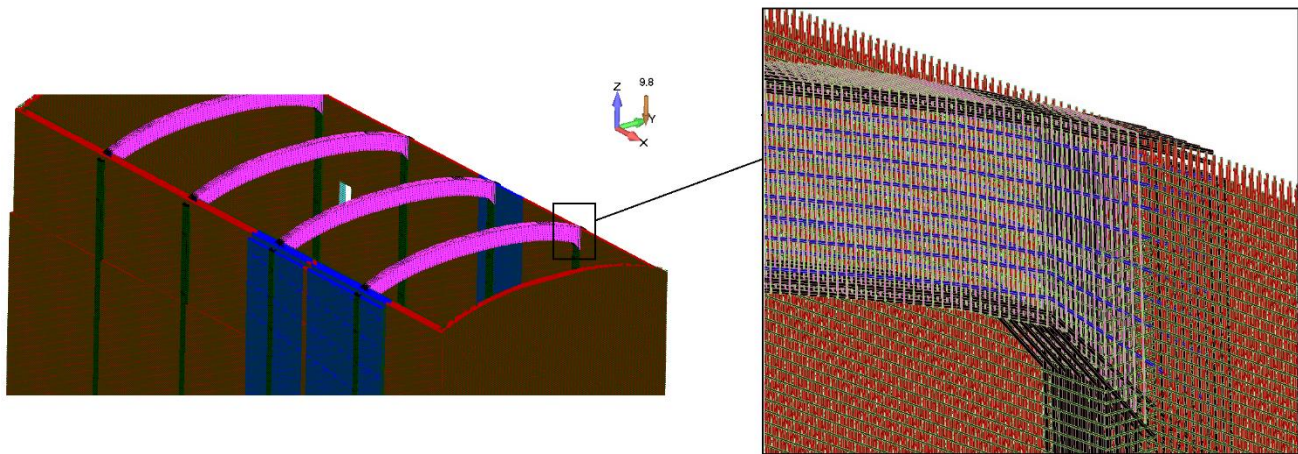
Redesigned RC framing system. Embedded rebar elements of the arch beams, columns and exterior walls.
